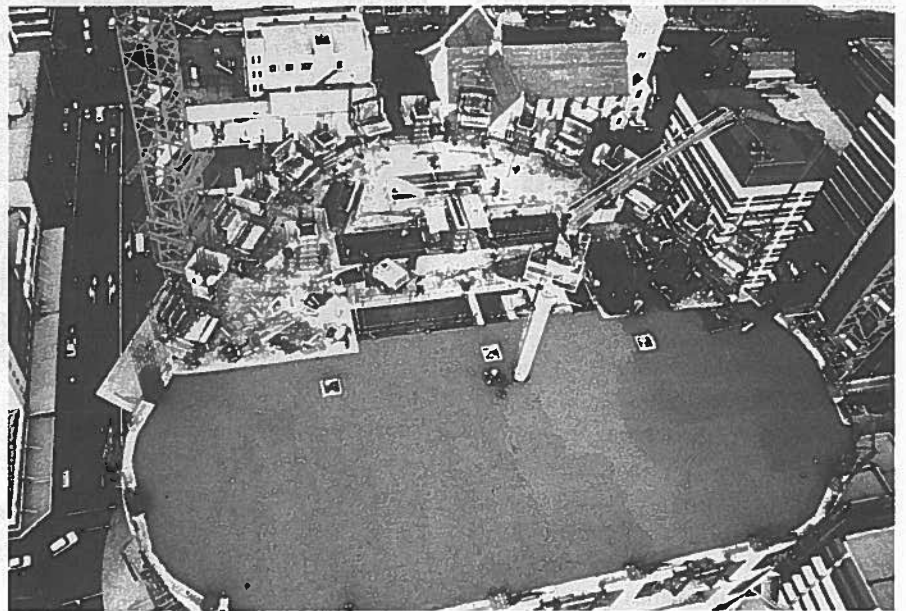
Construction of 152 m (499 ft) Coopers and Lybrand Tower using System 2 in New Zealand.
